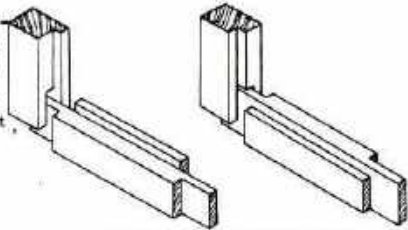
TENON WITH LONG AND SHORT SHOULDERS
